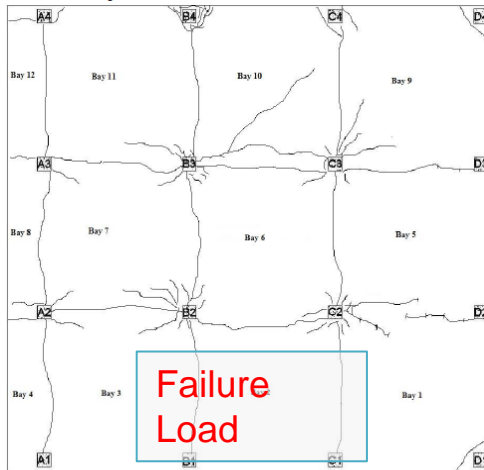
Top of Slab Crack Pattern at Ultimate Load
